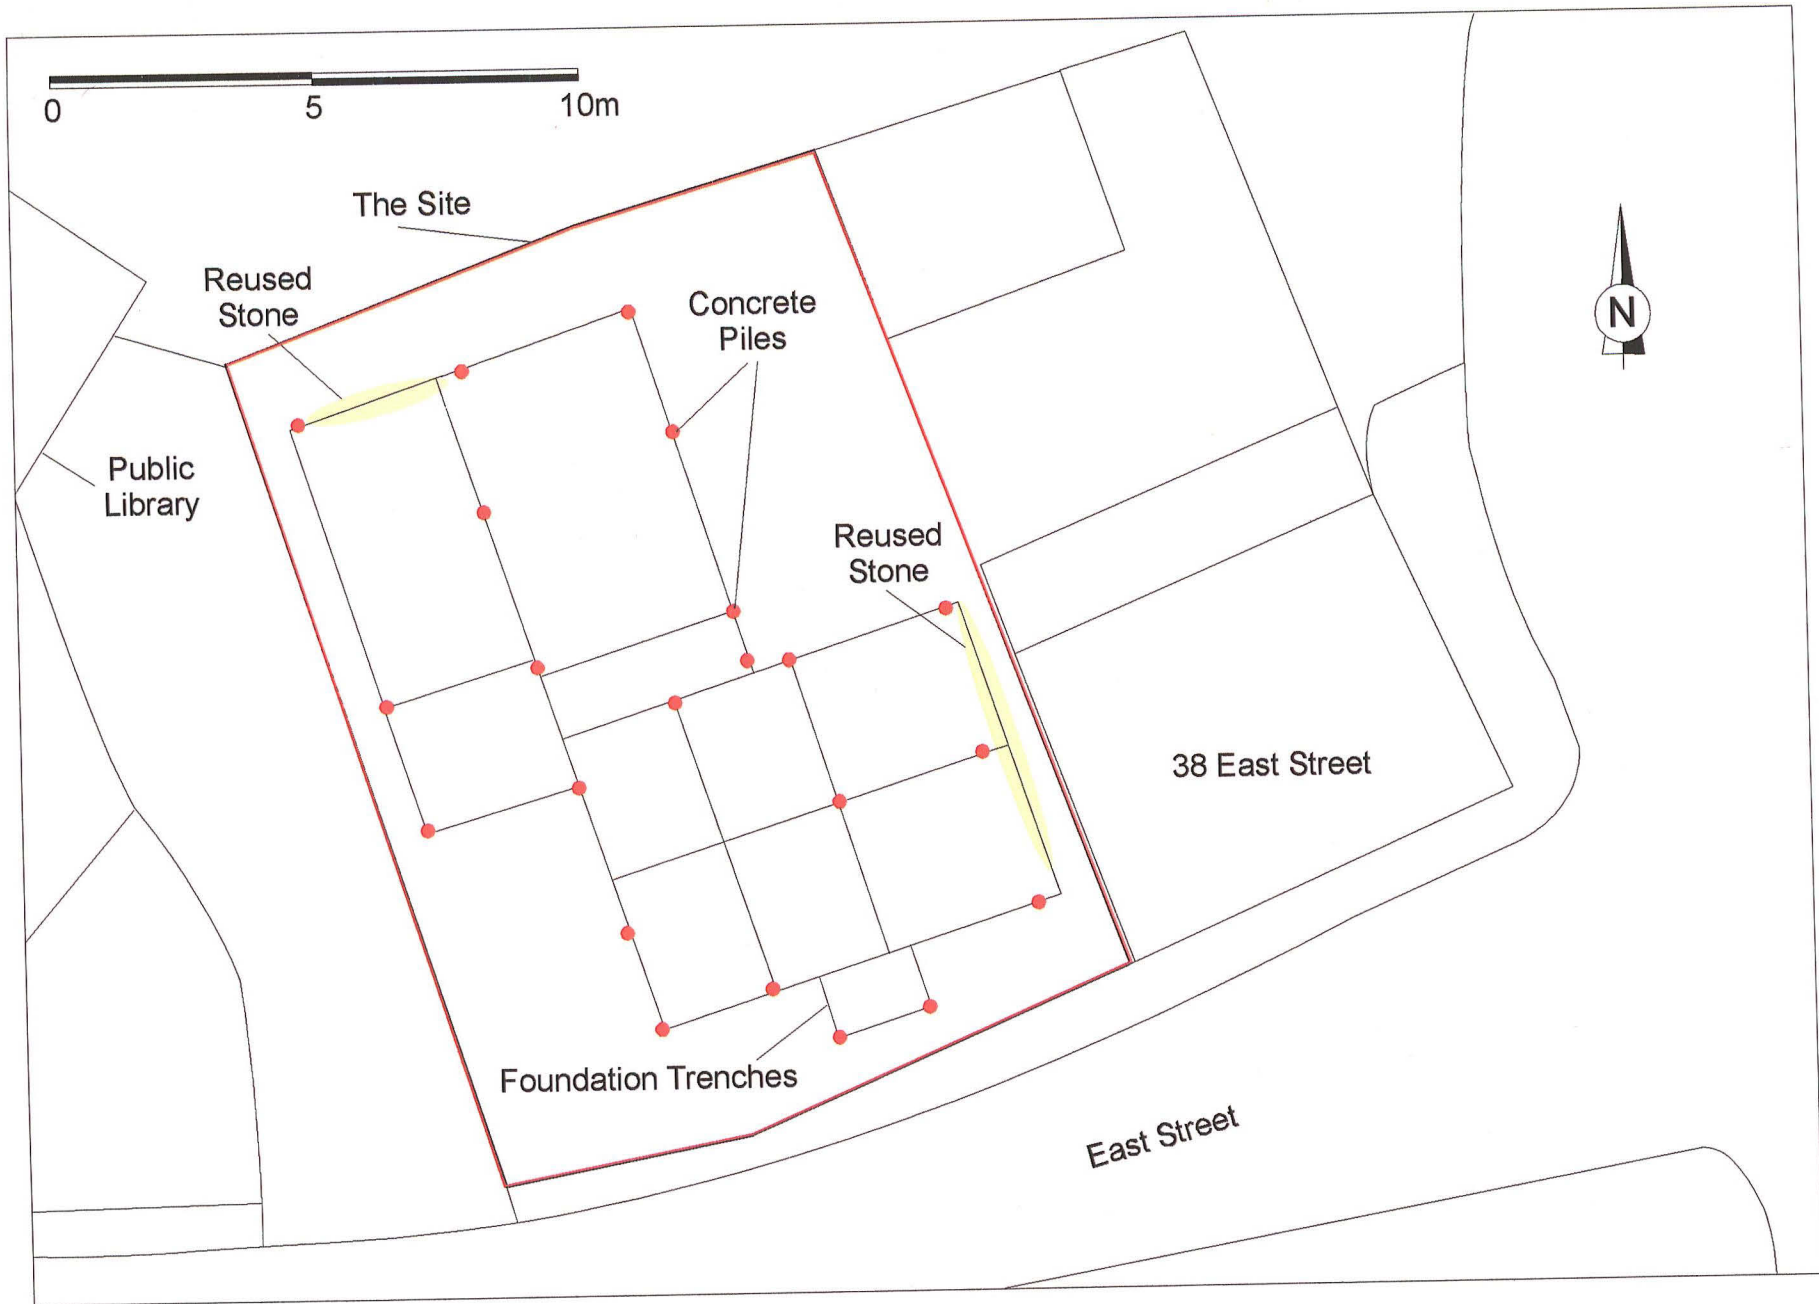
Plan showing the layout of ground beam trenches, concrete piles and re-used stone (based on a plan supplied by the developer)
